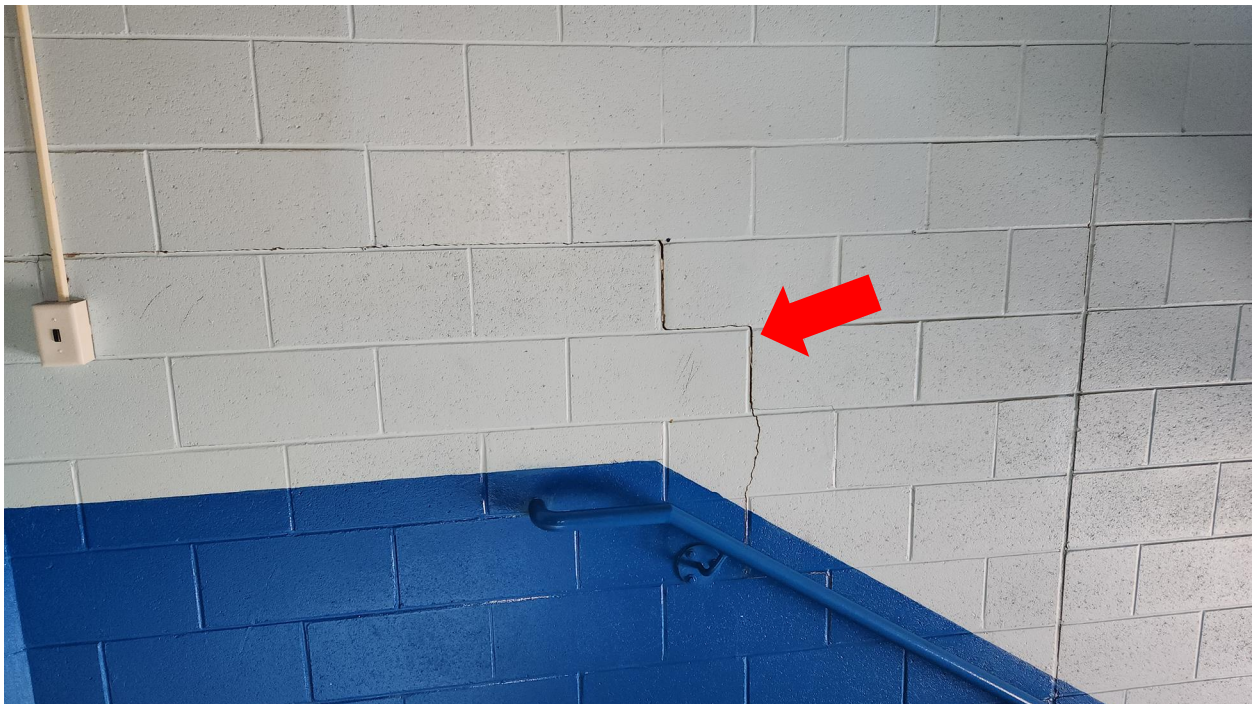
Masonry wall cracks at the southwest stair addition (c.2000).
